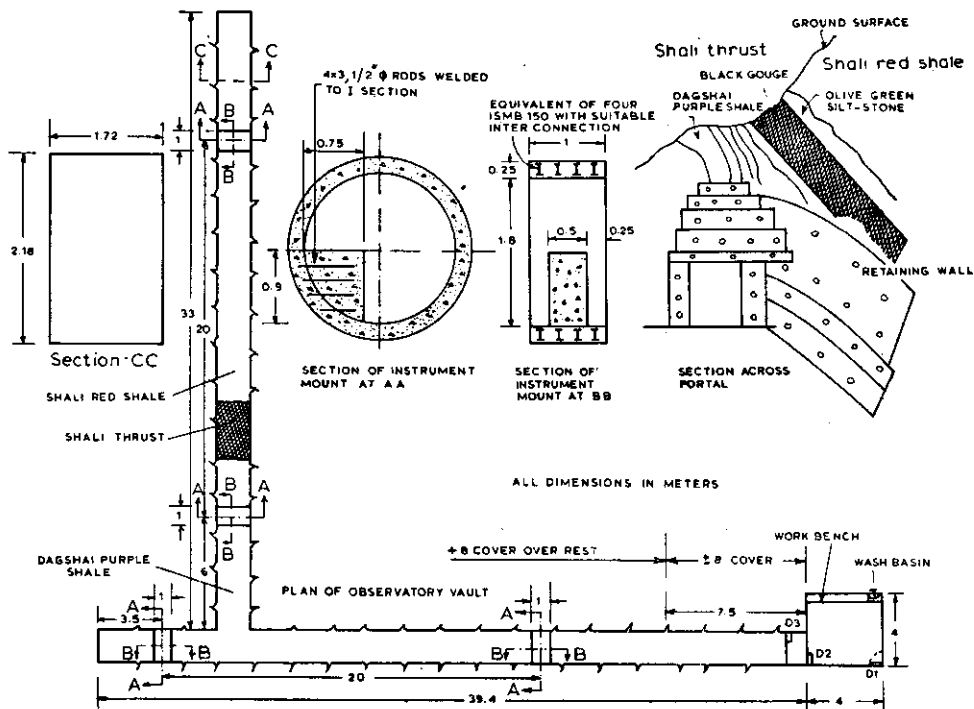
Some of the Details of the Observatory Vault Under Construction at Harabagh
